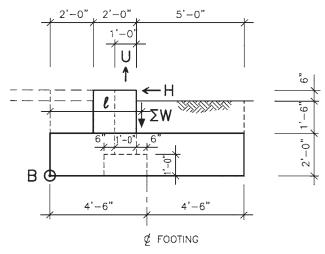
Forces acting on foundation for Case 2 of Example 12.1.
